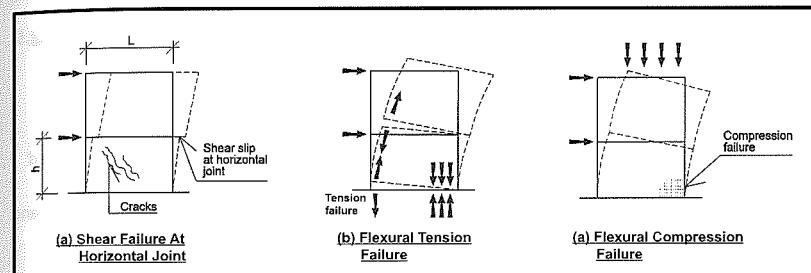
Failure Mode Of Cantilever Precast Concrete Walls
